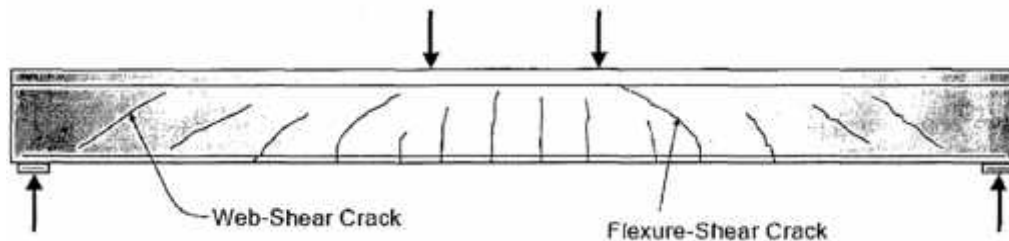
Different types of cracks in RC beam (Yalavarthy, 2010)
